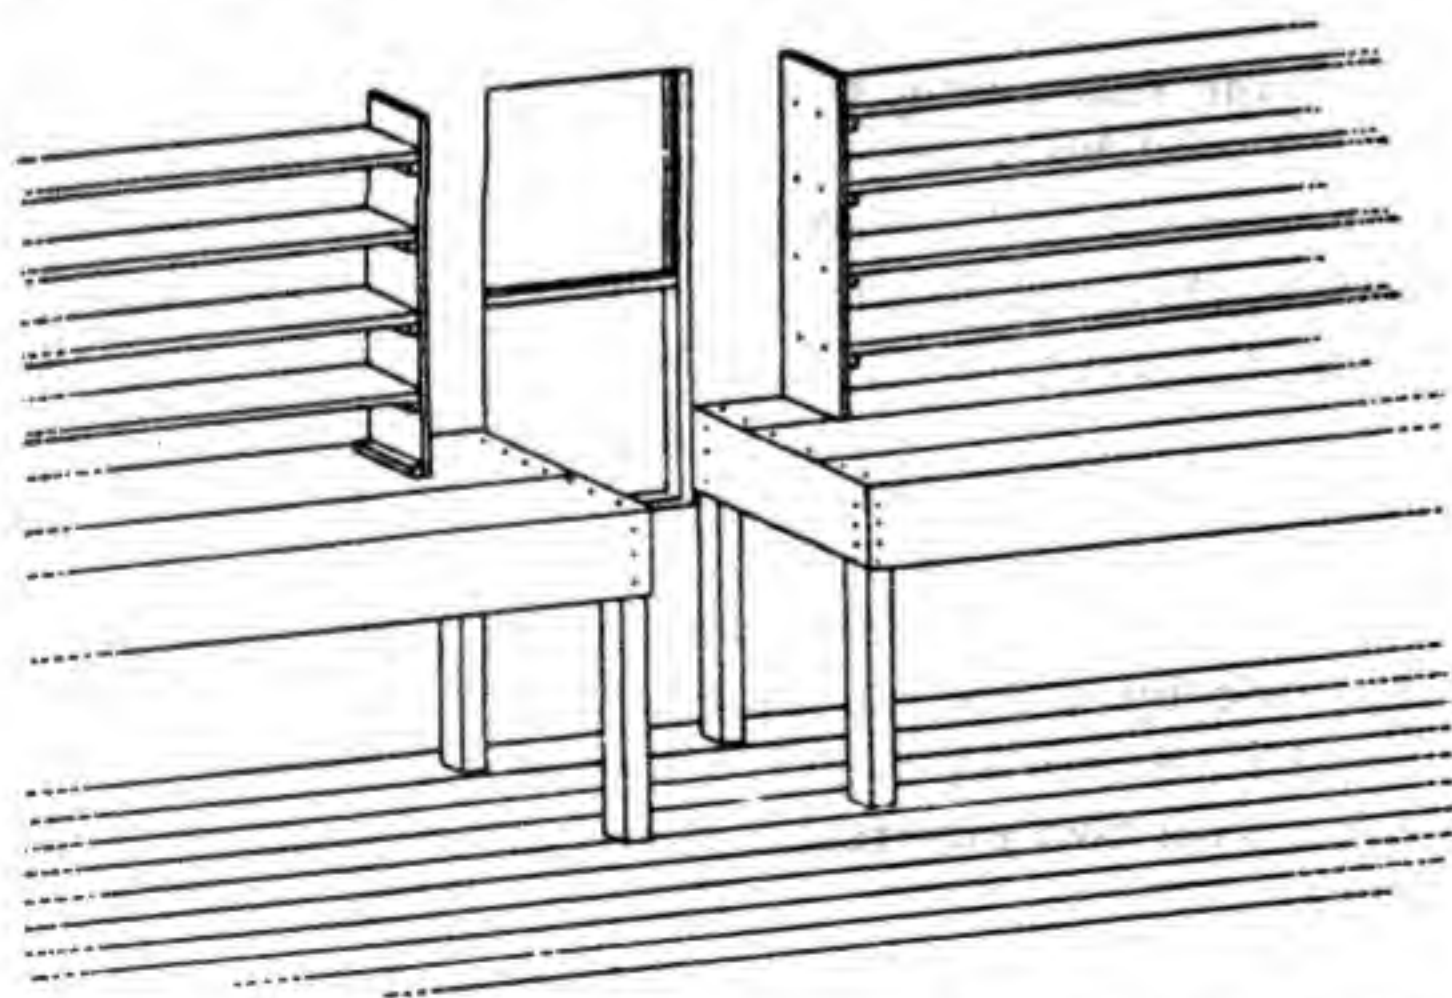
How the Laboratory Shelves and Benches Can be Constructed.
